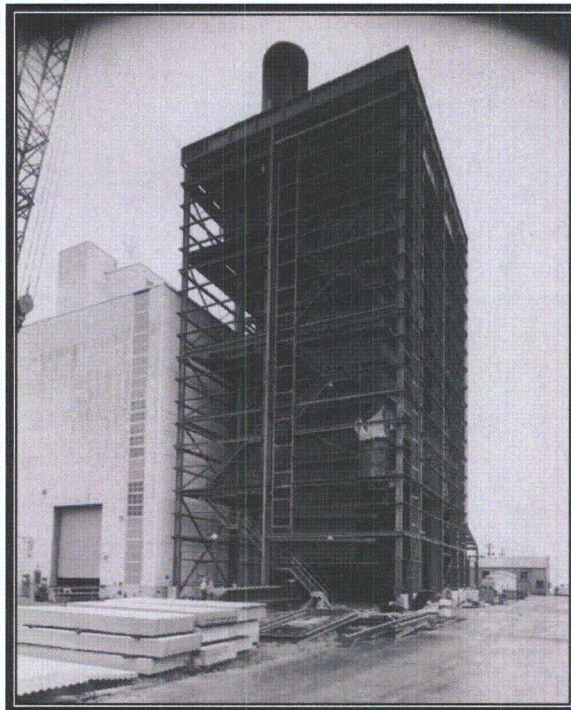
Construction of oil-fired boiler house, ca. 1965 (Courtesy DECo)
